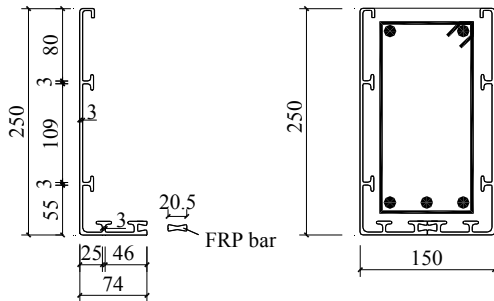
Pultruded GFRP profile and beam cross section (dimensions in mm)
